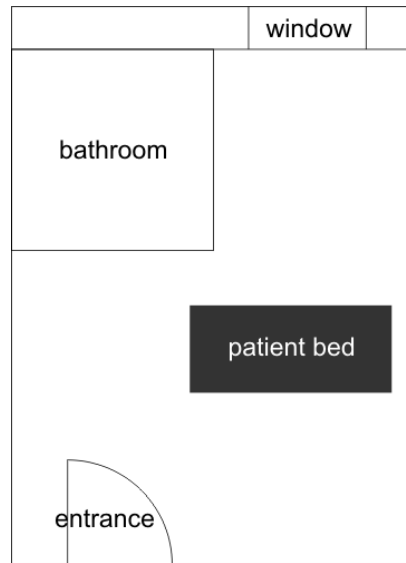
Outboard Bathroom Layout. Image Credit- Author.
